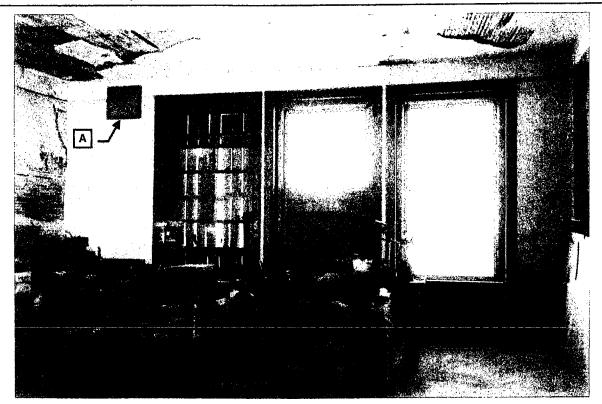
Room 8 view north. (A) North wall upper fresh air gravity vent.
